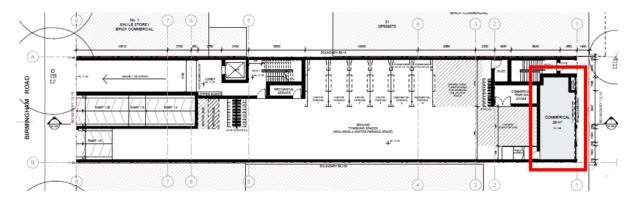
Ground floor plan, which shows the commercial tenancy outlined in red
